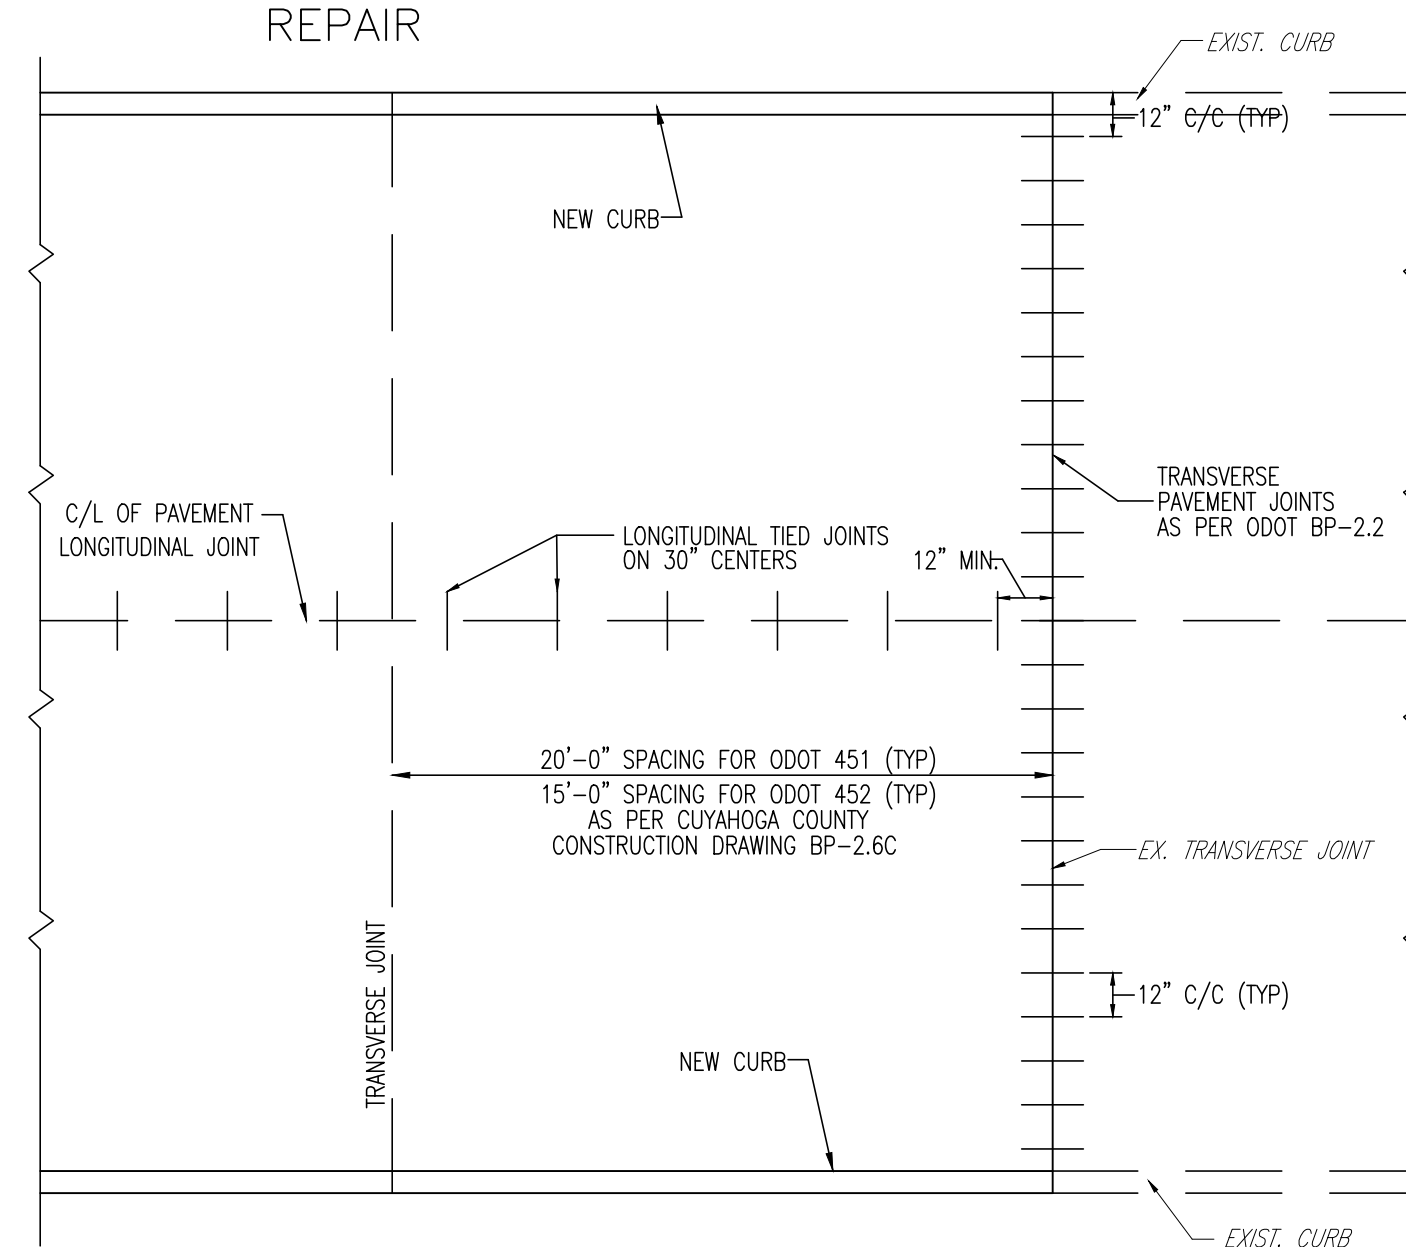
DETAIL MID-SLAB REPLACEMENT FULL WIDTH
